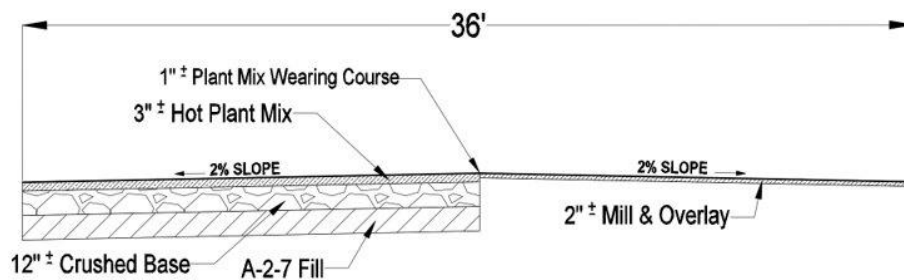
Rawlins Cross Section (Sta: 1+00 to Sta: 4+23)
